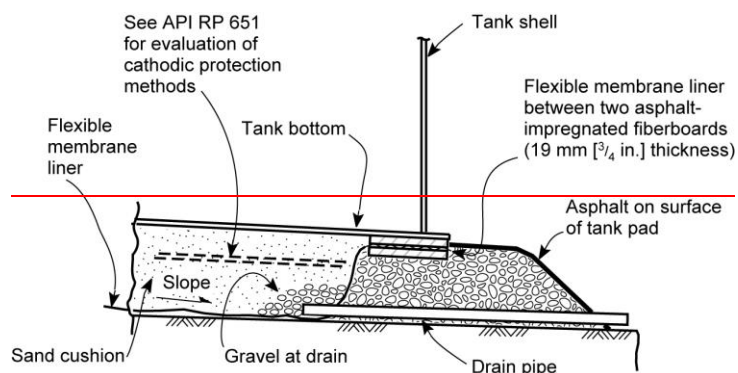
Earthen Foundation and Crushed Stone Ringwall with Undertank Leak Detection at the Tank Perimeter (Typical Arrangement)
